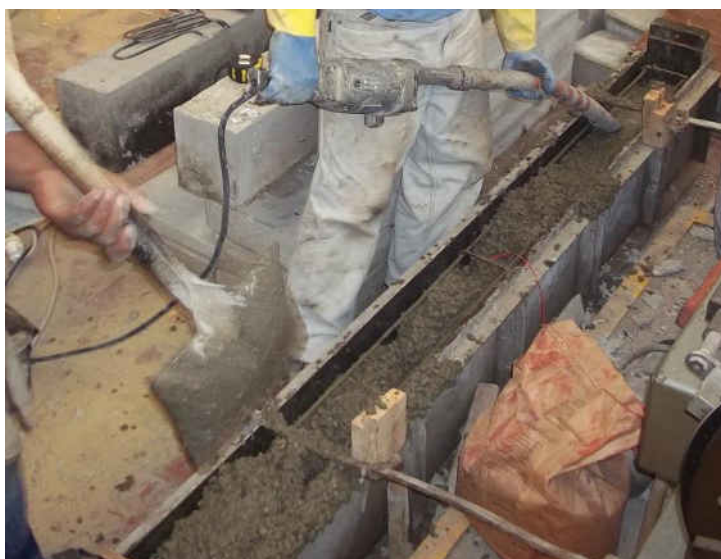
Casting and Compaction of the Test Beams in their Steel Moulds
